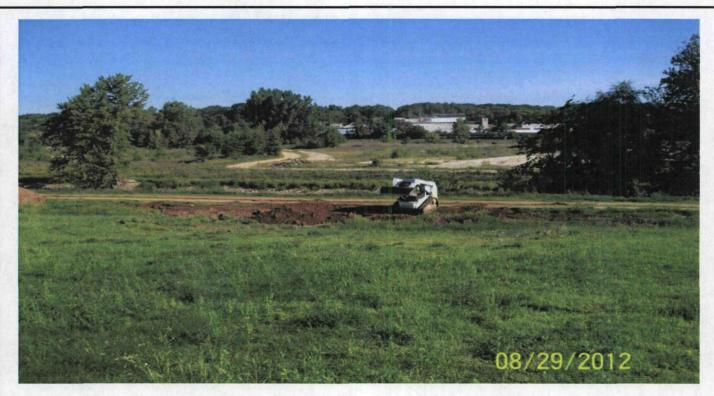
Looking north at Terra preparing the low-spot in the drainage swale for seed and mulch by placing additional topsoil in the area.
